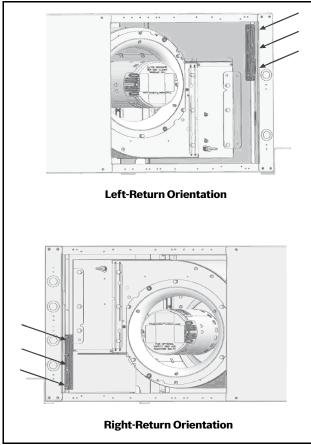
HZ E-Heat Control Box Mounting Bracket Location
